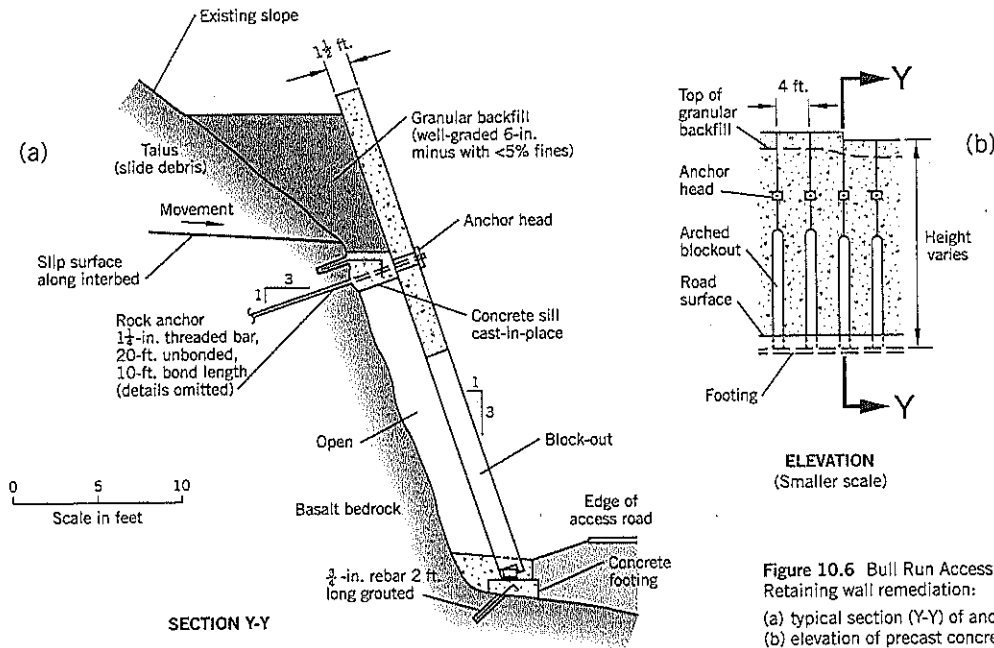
Bull Run Access Road Slide. Retaining wall remediation: (a) typical section (Y-Y) of anchored wall (b) elevation of precast concrete wall units
